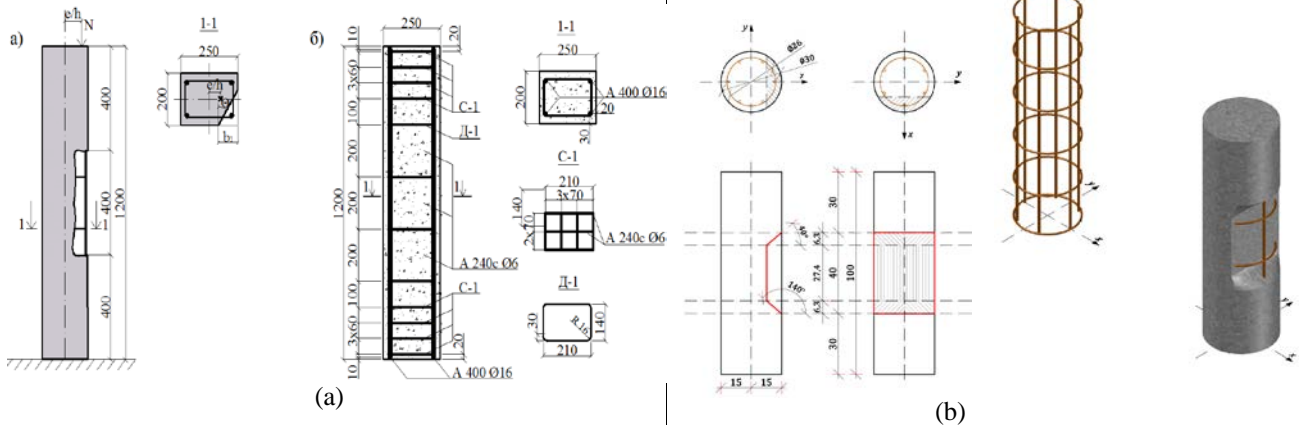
Scheme of column models (samples) with internal reinforcements and designed damage
